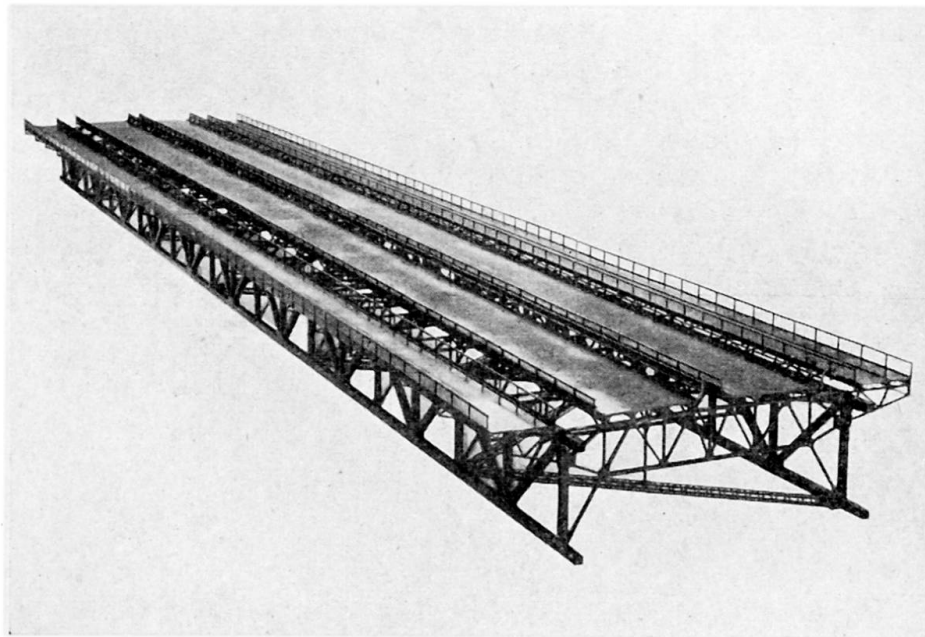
Sectional model of design proposed for the Severn Bridge (1/32-scale)
